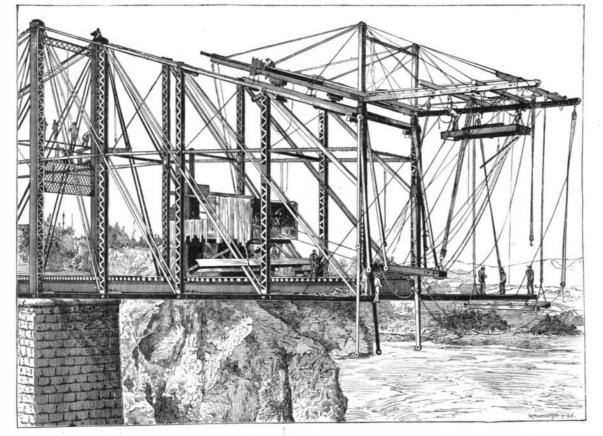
STEEL CANTILEVER BRIDGE AT ST. JOHN.-PROCESS OF ERECTION AND PLANT.
